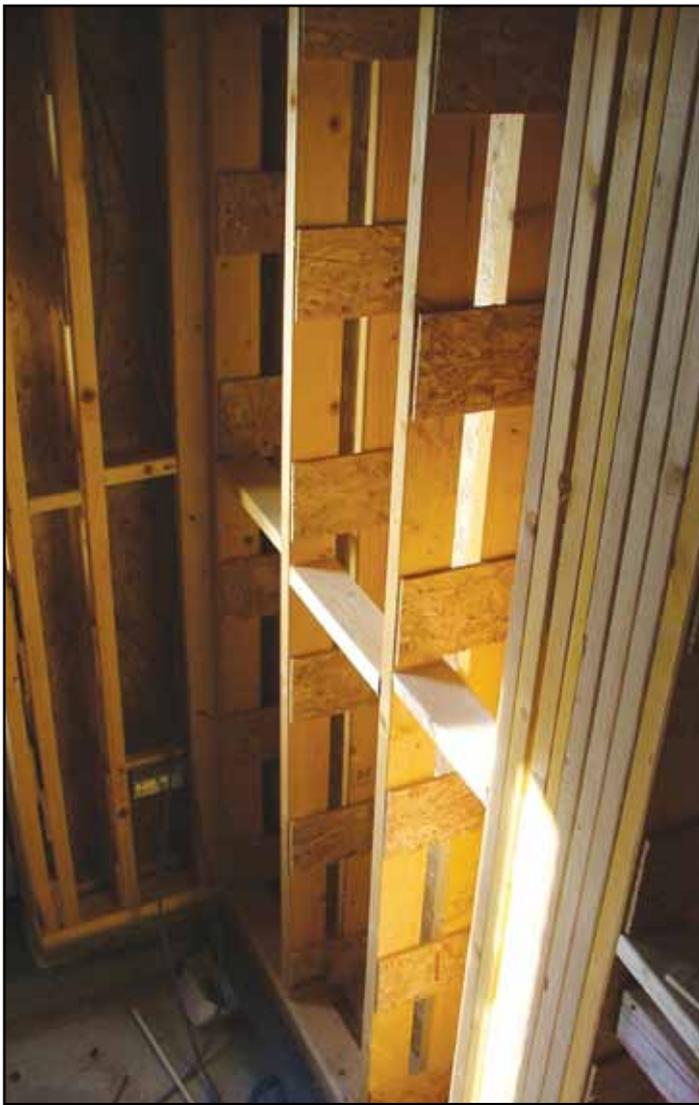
Twin-wall construction with OSB gussets prior to filling with insulant (image: courtesy of Williams Homes)
